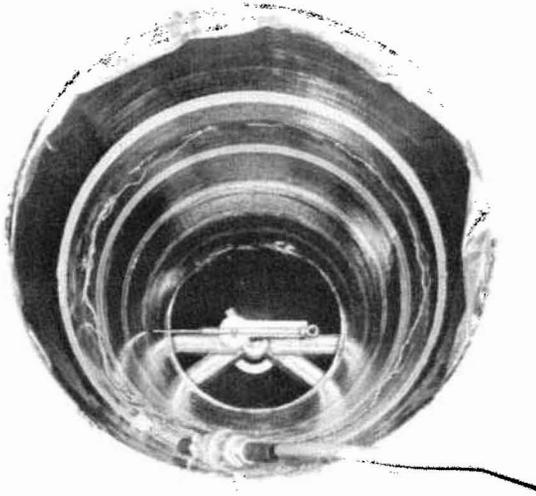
18-inch (46-cm) diameter FRP pipe in soil container prior to loading (Test H). Photo P801-D-73871
